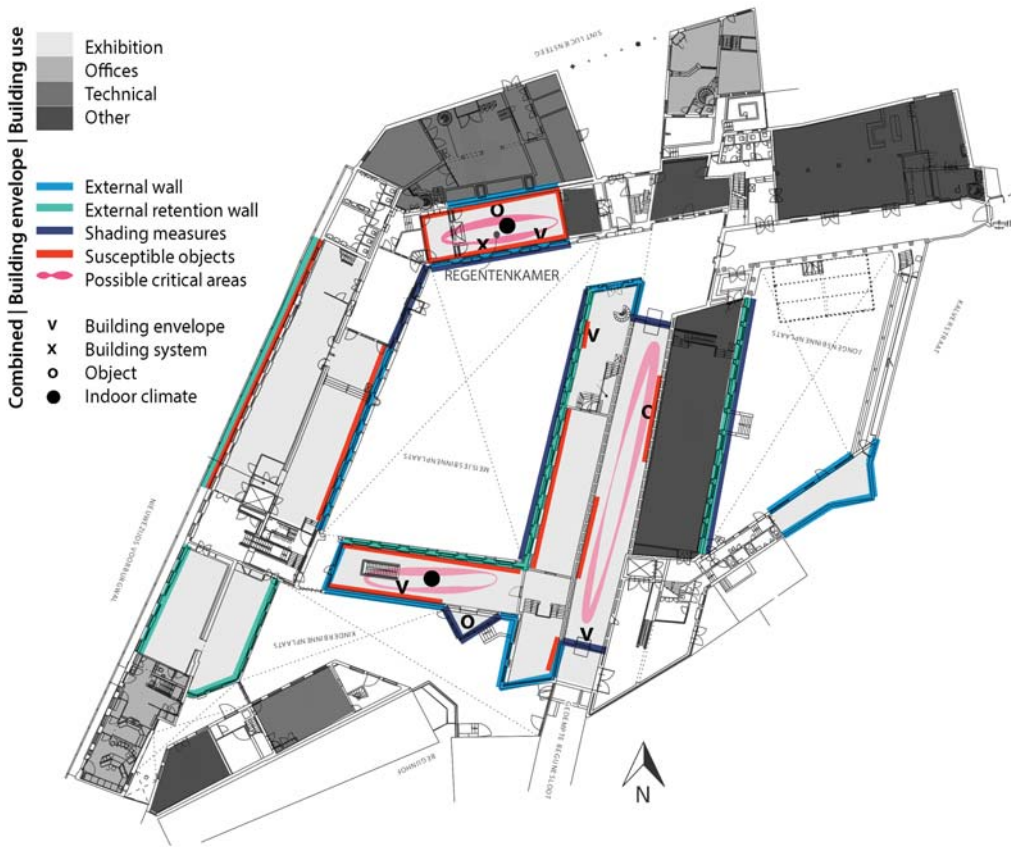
Overview of building use, building envelope and critical areas and location of the ground floor of M1.
